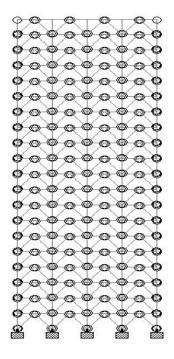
Elevation of the Steel frame with inverted V- bracing
